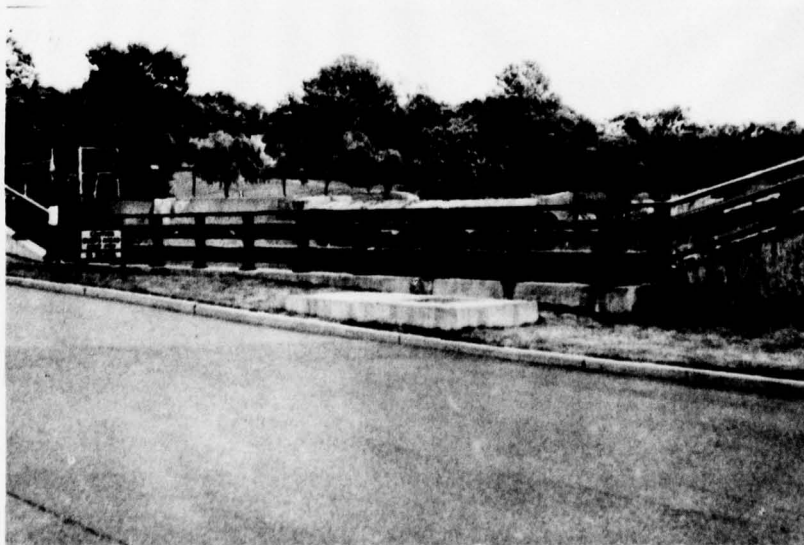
View of dam from bank parking lot. Dam is partially hidden by guard railing on parking lot retaining wall.
